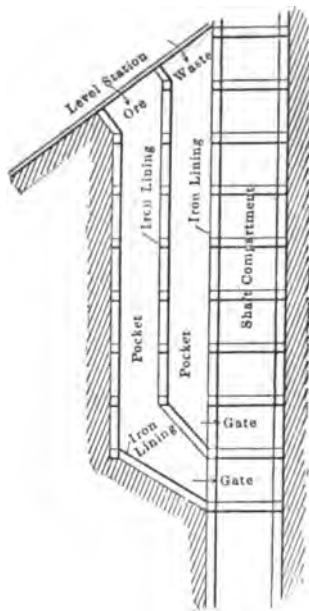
ARRANGEMENT OF SKIP POCKETS AT BUNKER HILL MINE.
